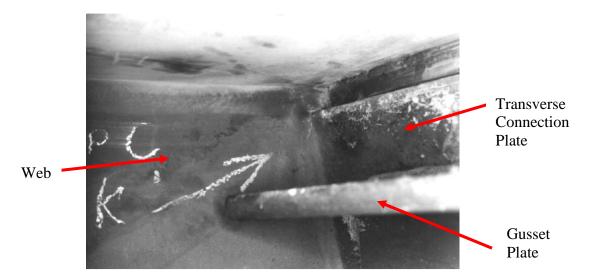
Web Cracking at Box Girder Diaphragm Connection Plate
